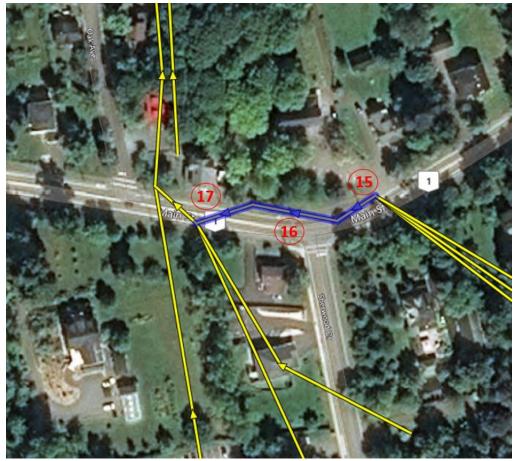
Proposed Upgrades for Stormwater Pipes near Main Street and Sherwood Drive
